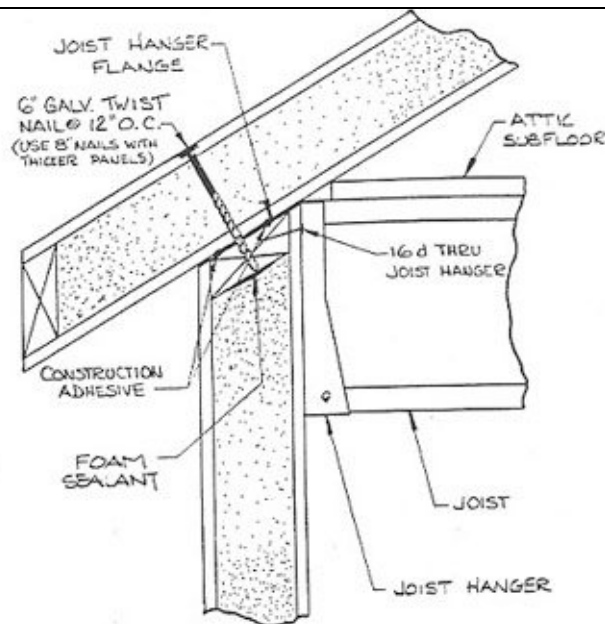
Attic Joist and Floor Detail with Shallow Slope Roofs: Bend the top flange of joist hangers to fit over the angled top spline on the wall panels and nail in place. The attic floor will extend above the wall-roof intersection slightly.
